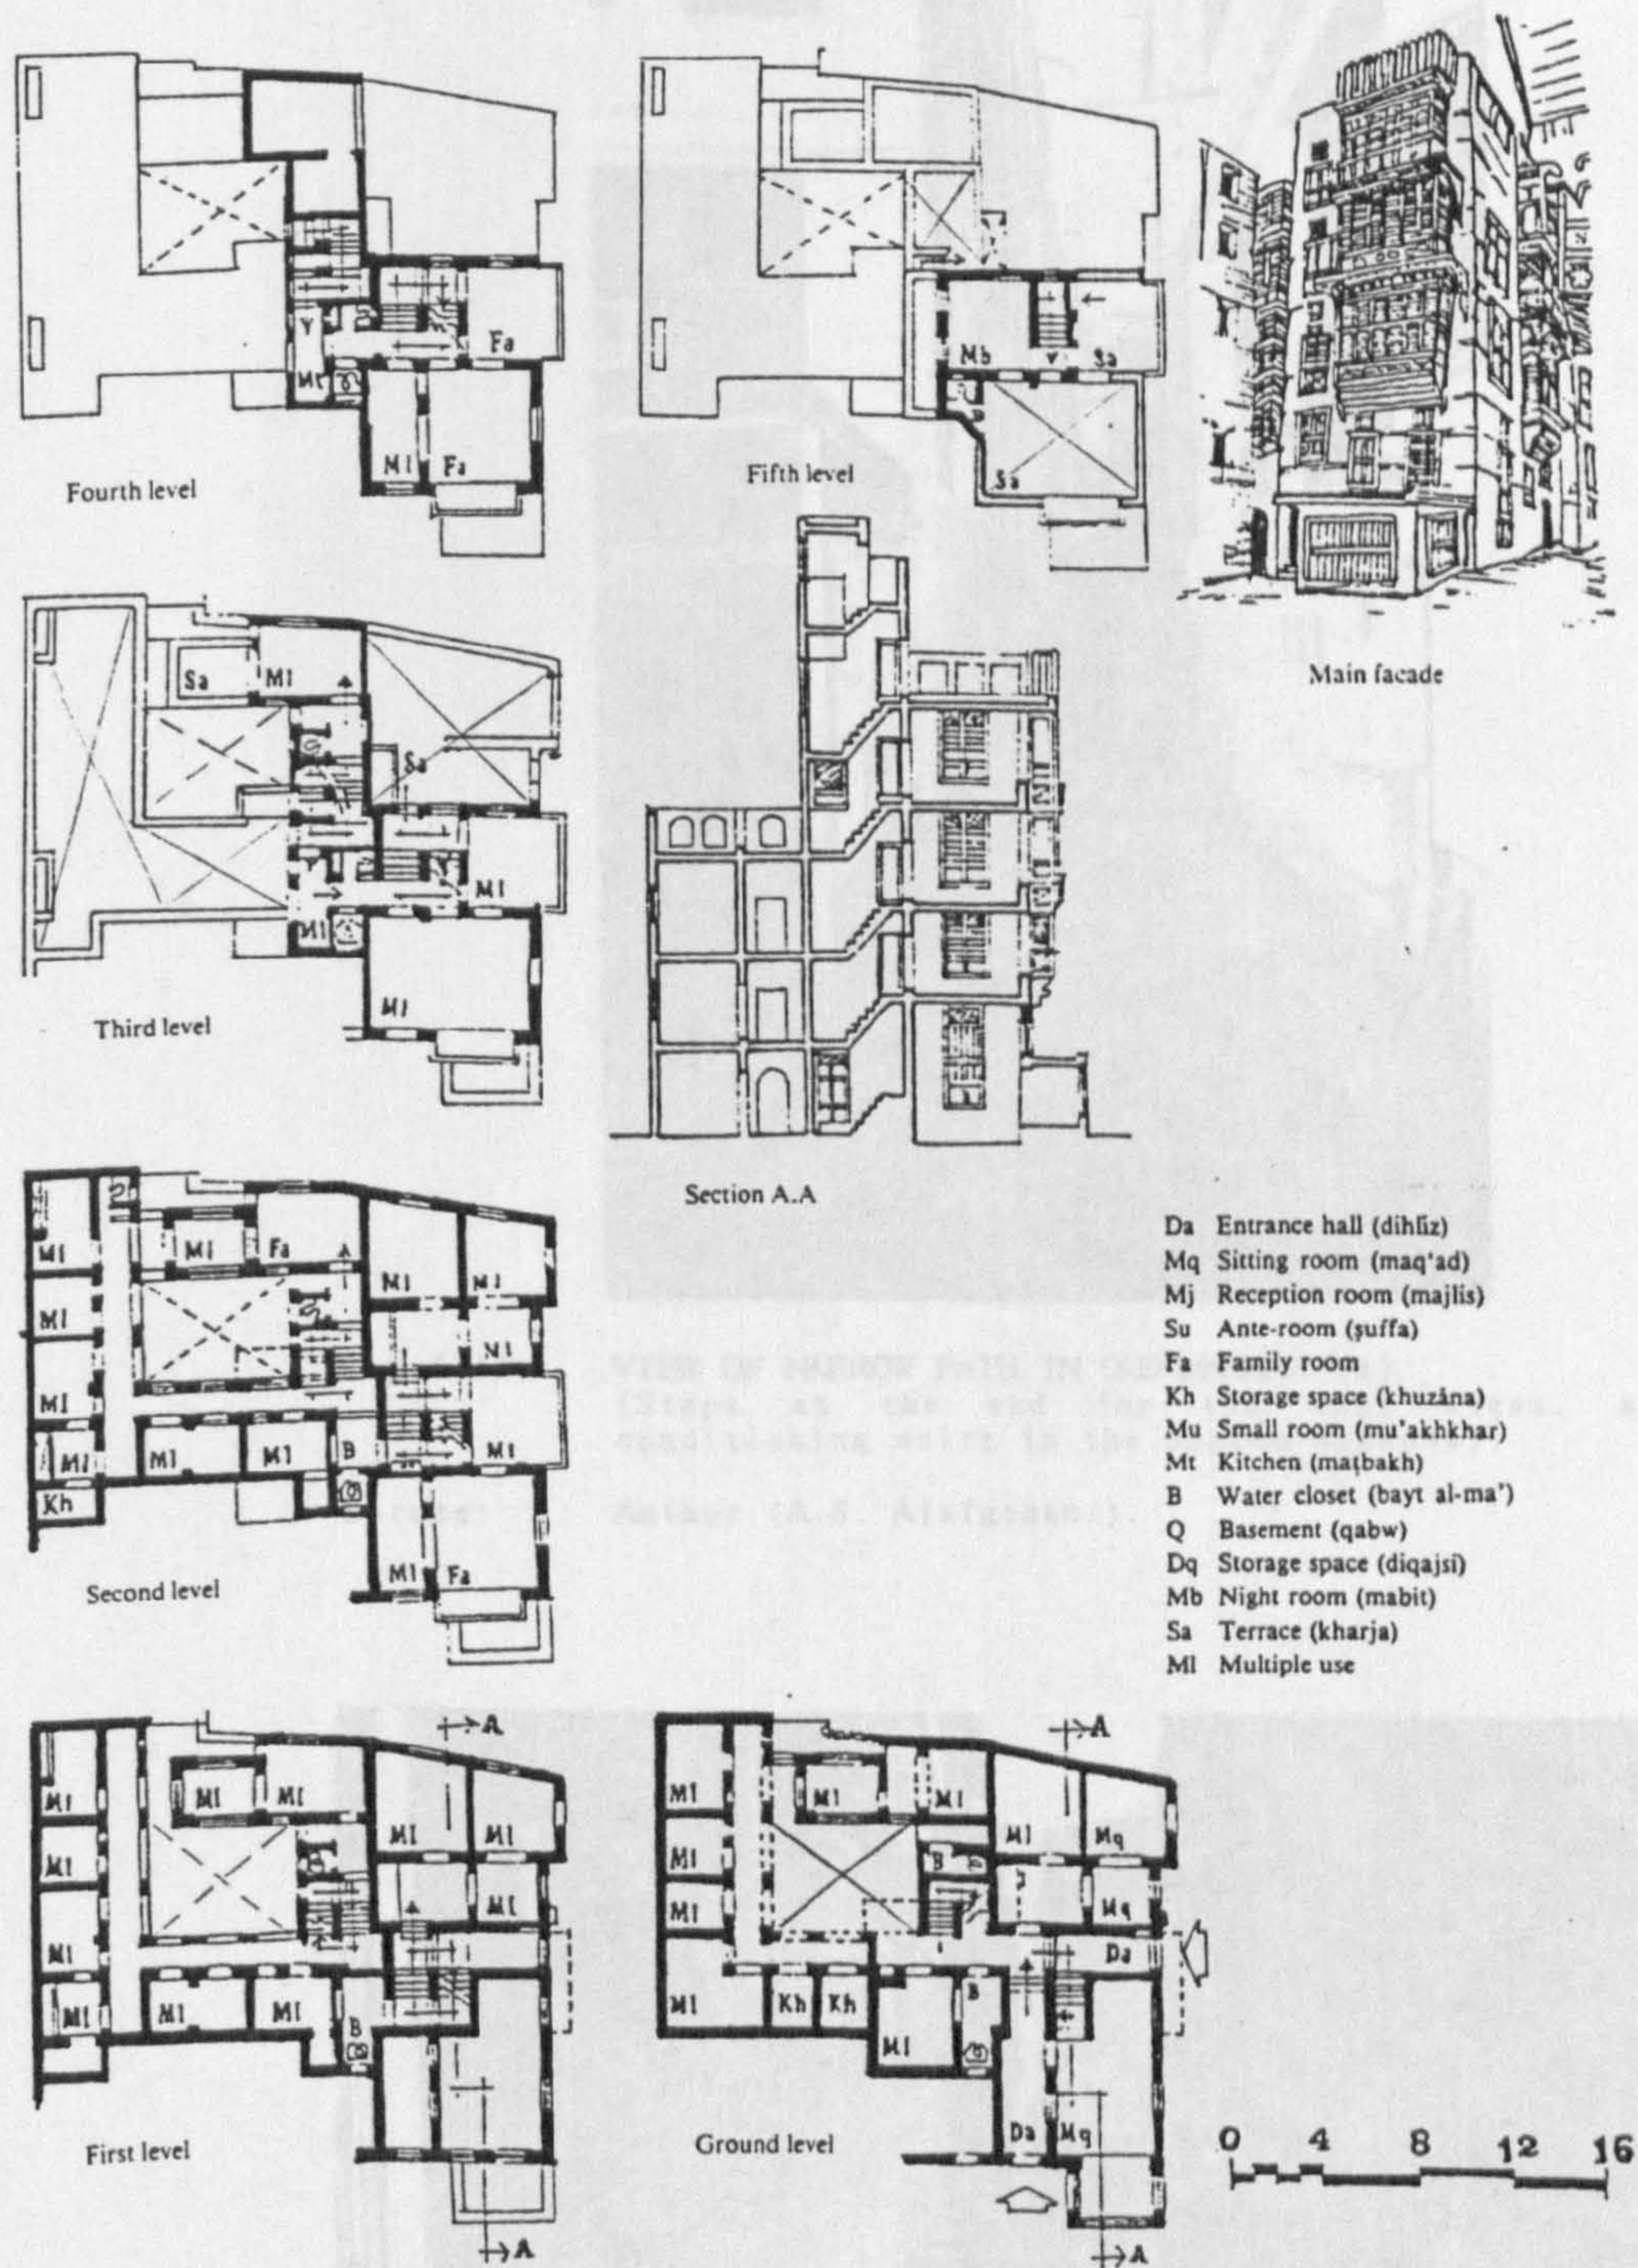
COMPLEX PLAN HOUSE, MAKKAH
